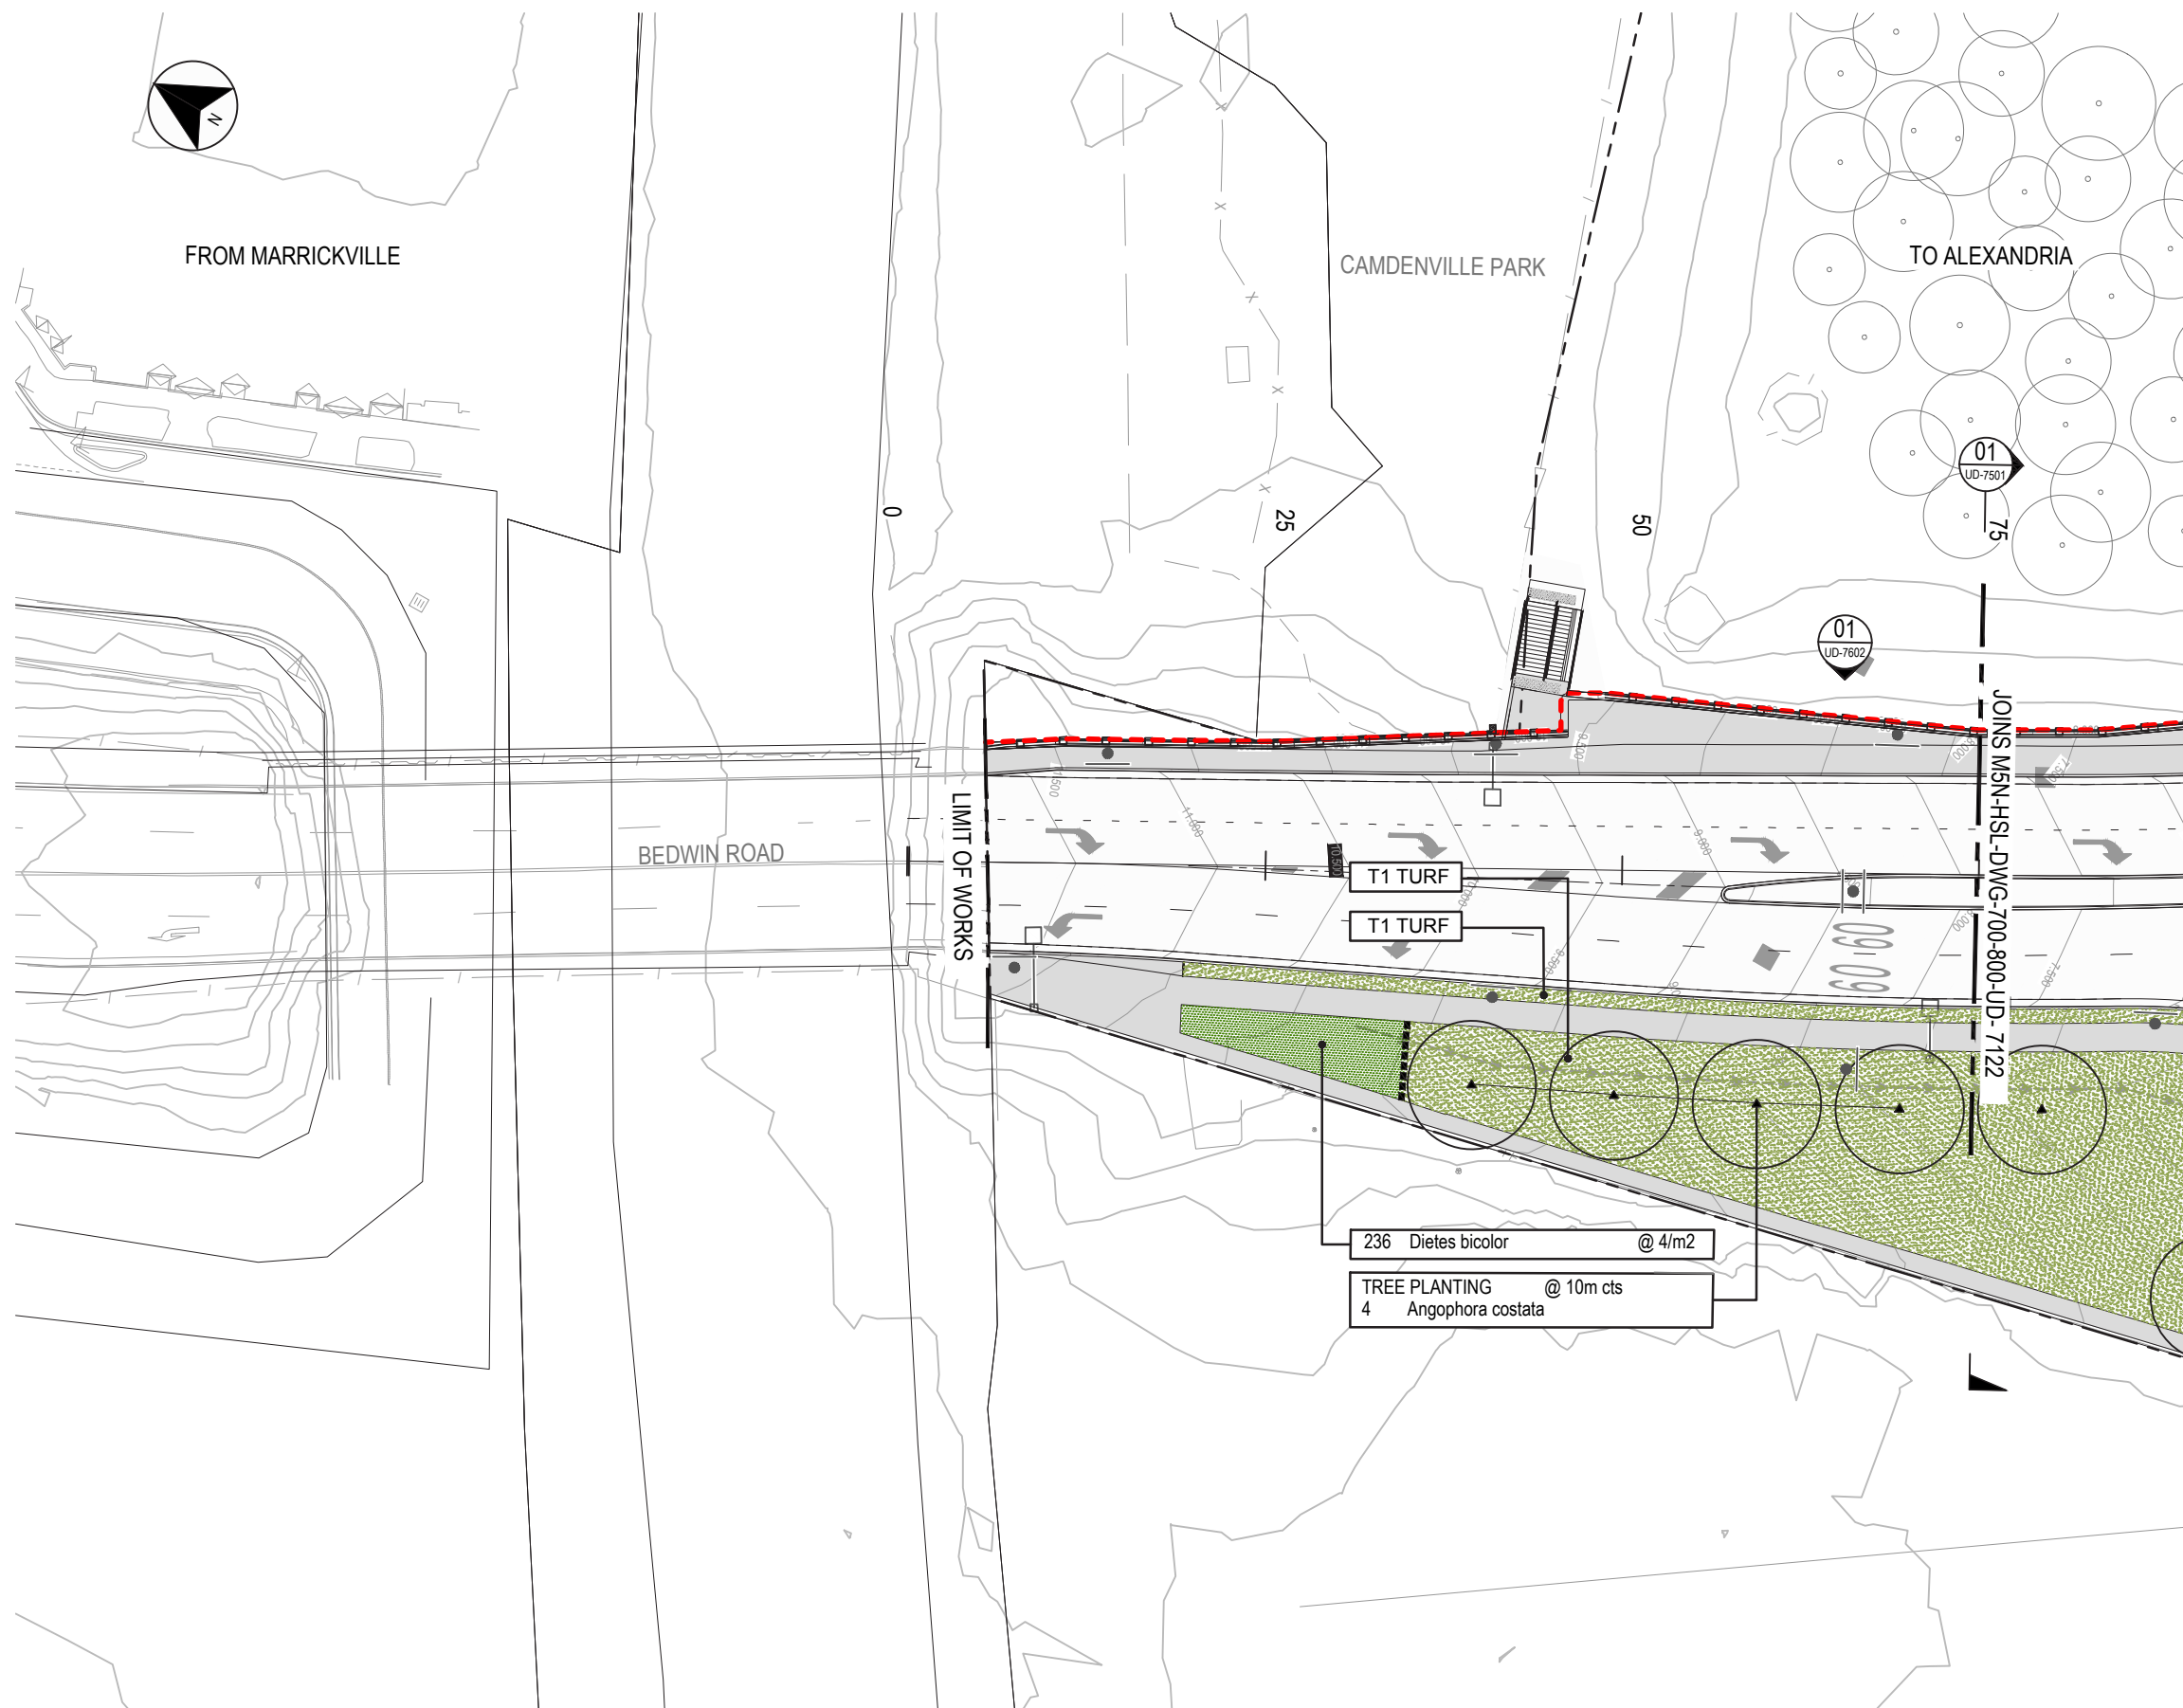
Campbell Street Urban Design and Landscape Plan - Key Plan
